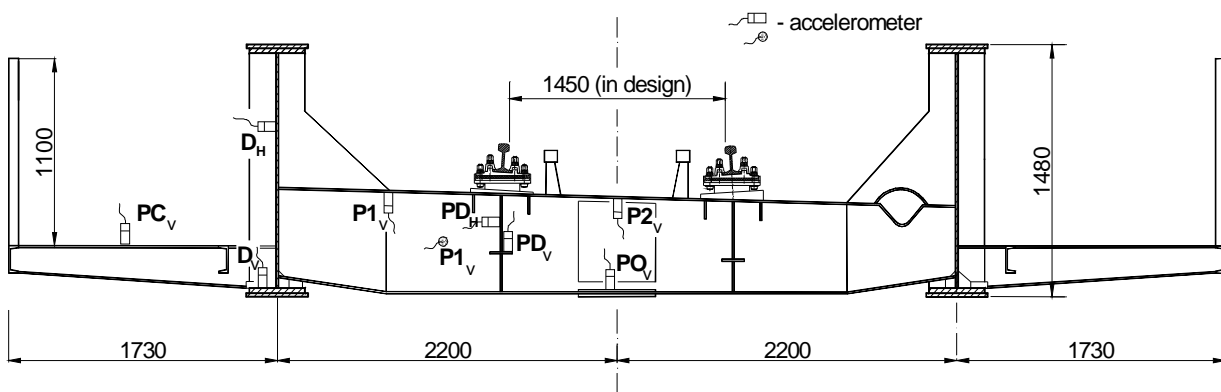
Cross-section of the bridge and layout of vibration measurement points
